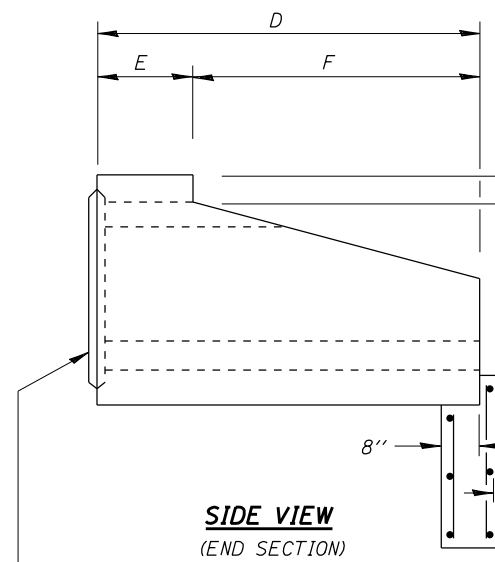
# DETAIL OF PRECAST CONCRETE BOX CULVERTS AND END SECTIONS
